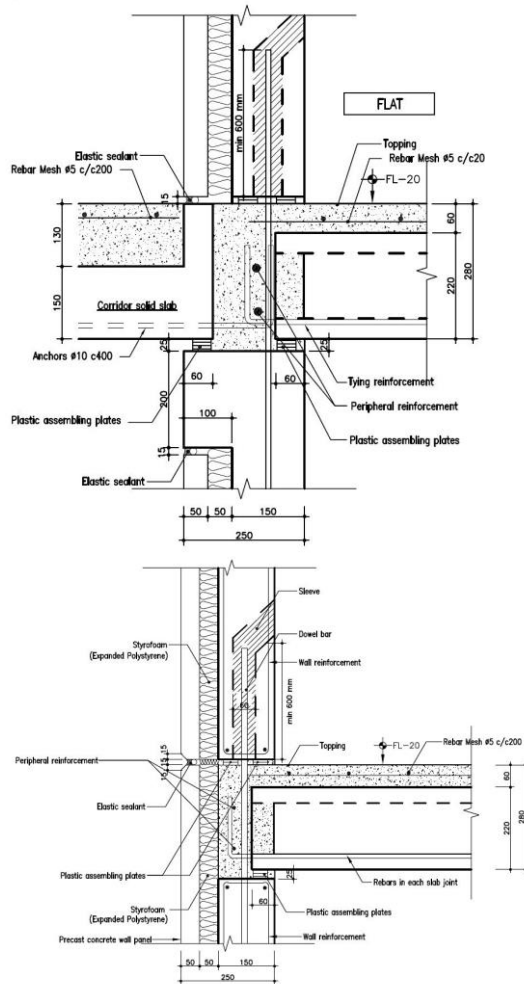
(a) Detail of the connection between the prefabricated parts and the internal corridor and the sandwich panel wall, which facilitates the flexibility of the design. (b) connection between prefabricated parts and ceiling and wall and simple structure technique that helps flexible design.
